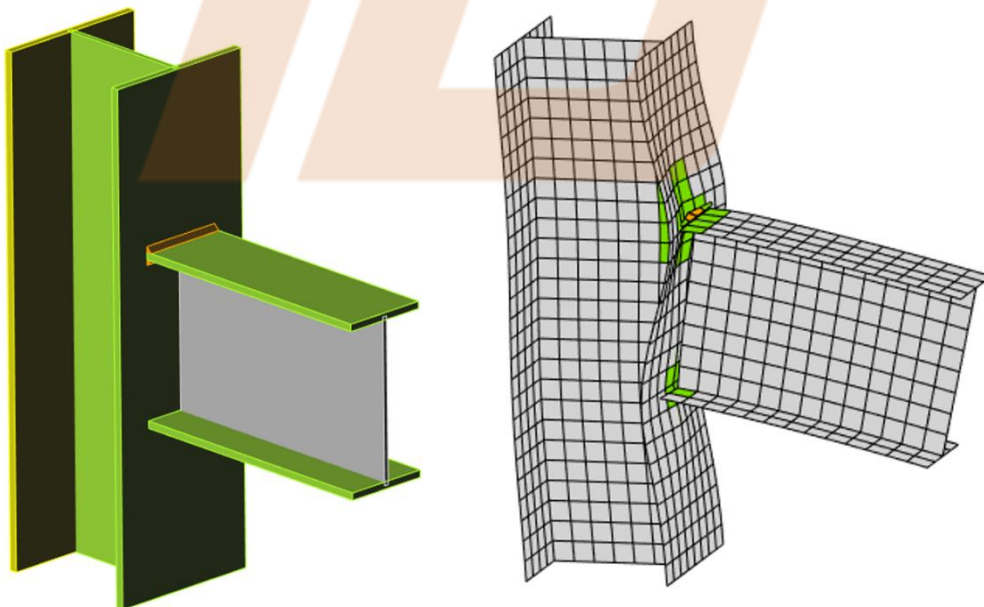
An example of edge to surface contact between the lower flange of the beam and the column flange.
